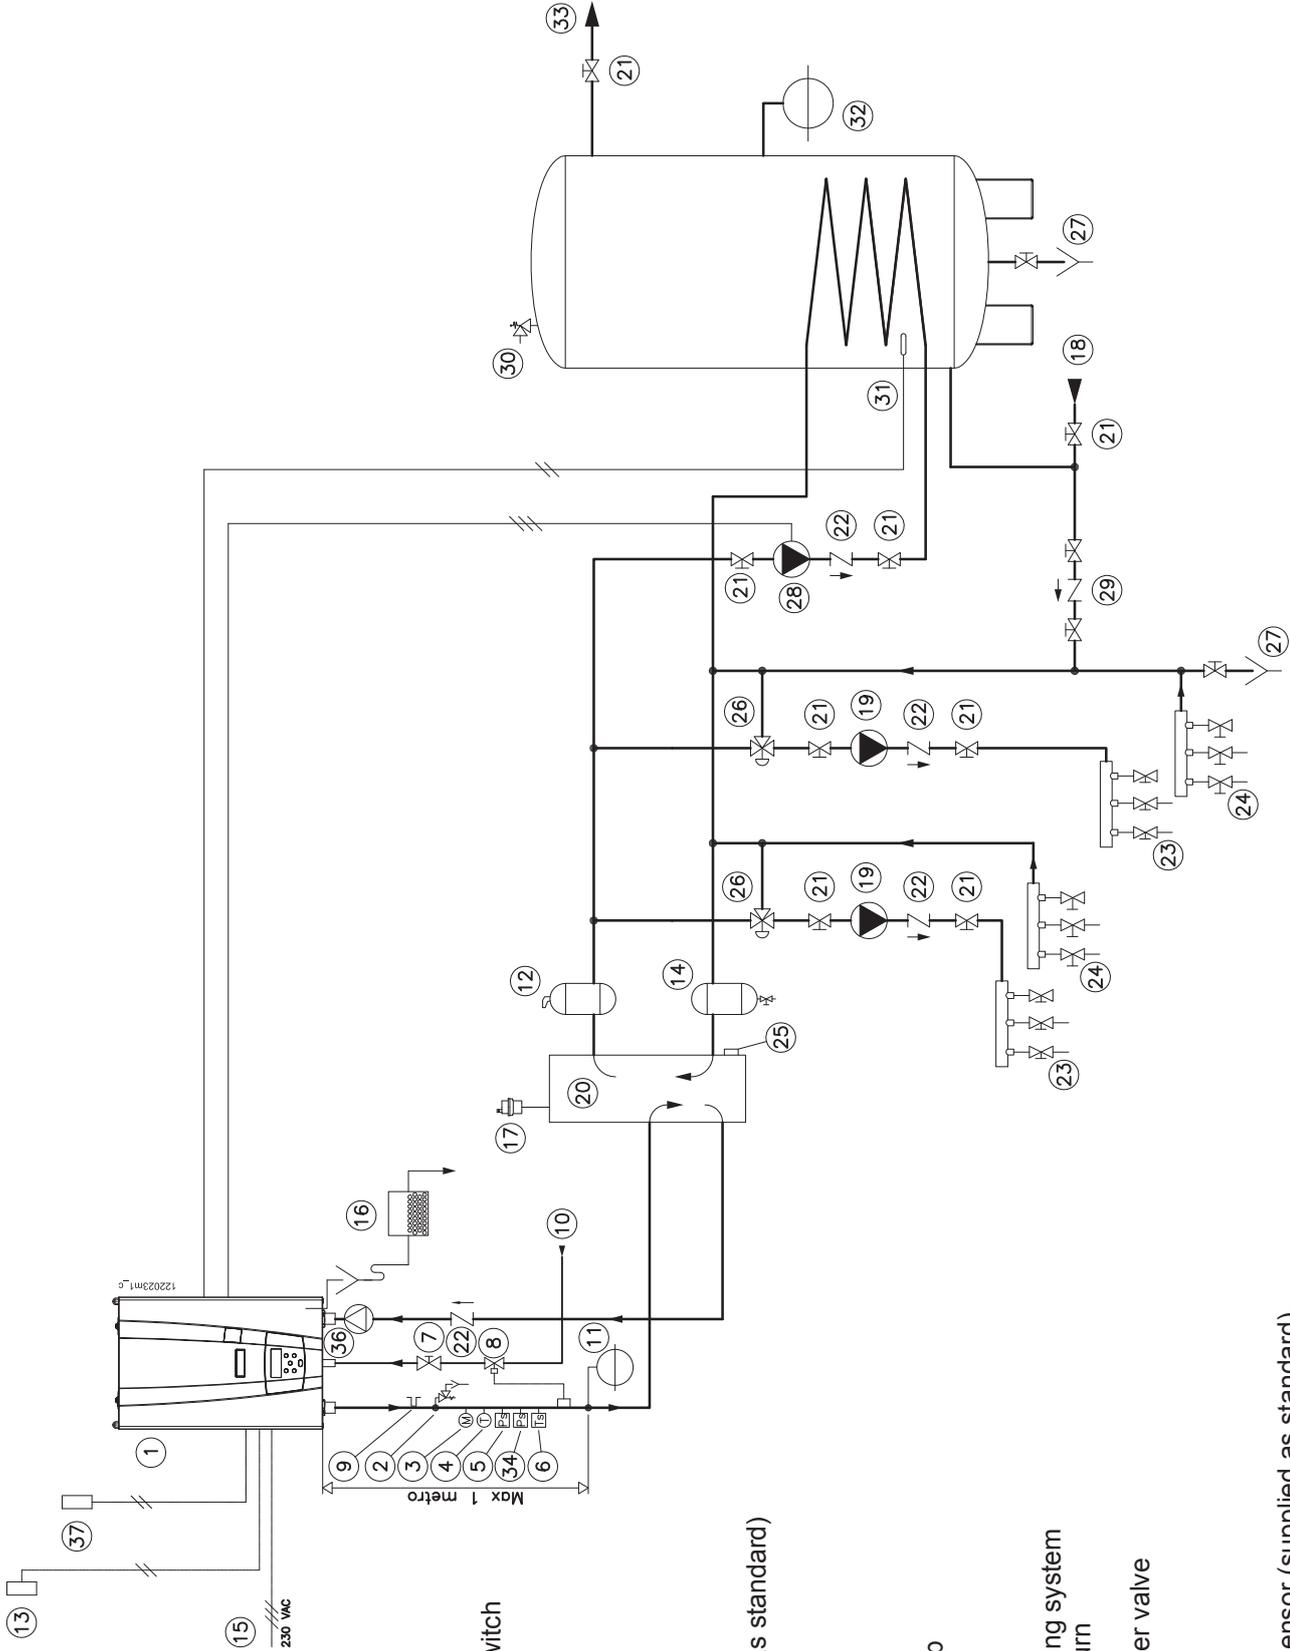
Example of connection diagram with hydraulic separator and storage tank
